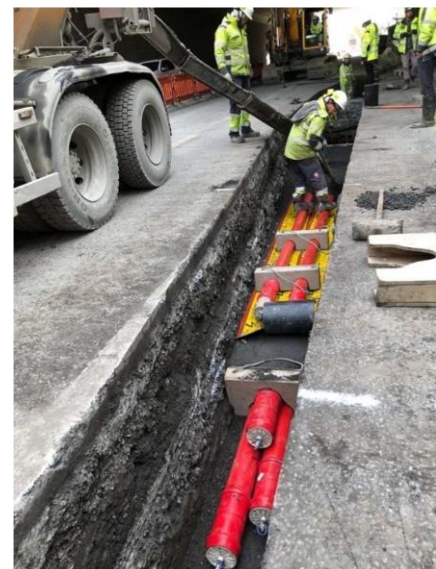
Example of cable ducts in a trench in the road, with telecommunication ducts positioned above
